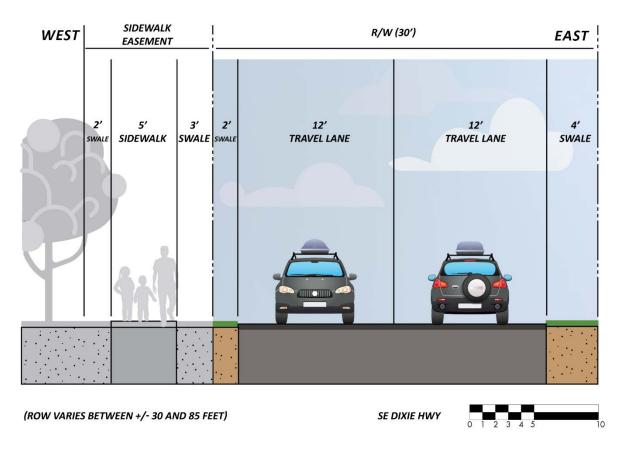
Existing Rural Typical Section for CR-A1A/Dixie Hwy
